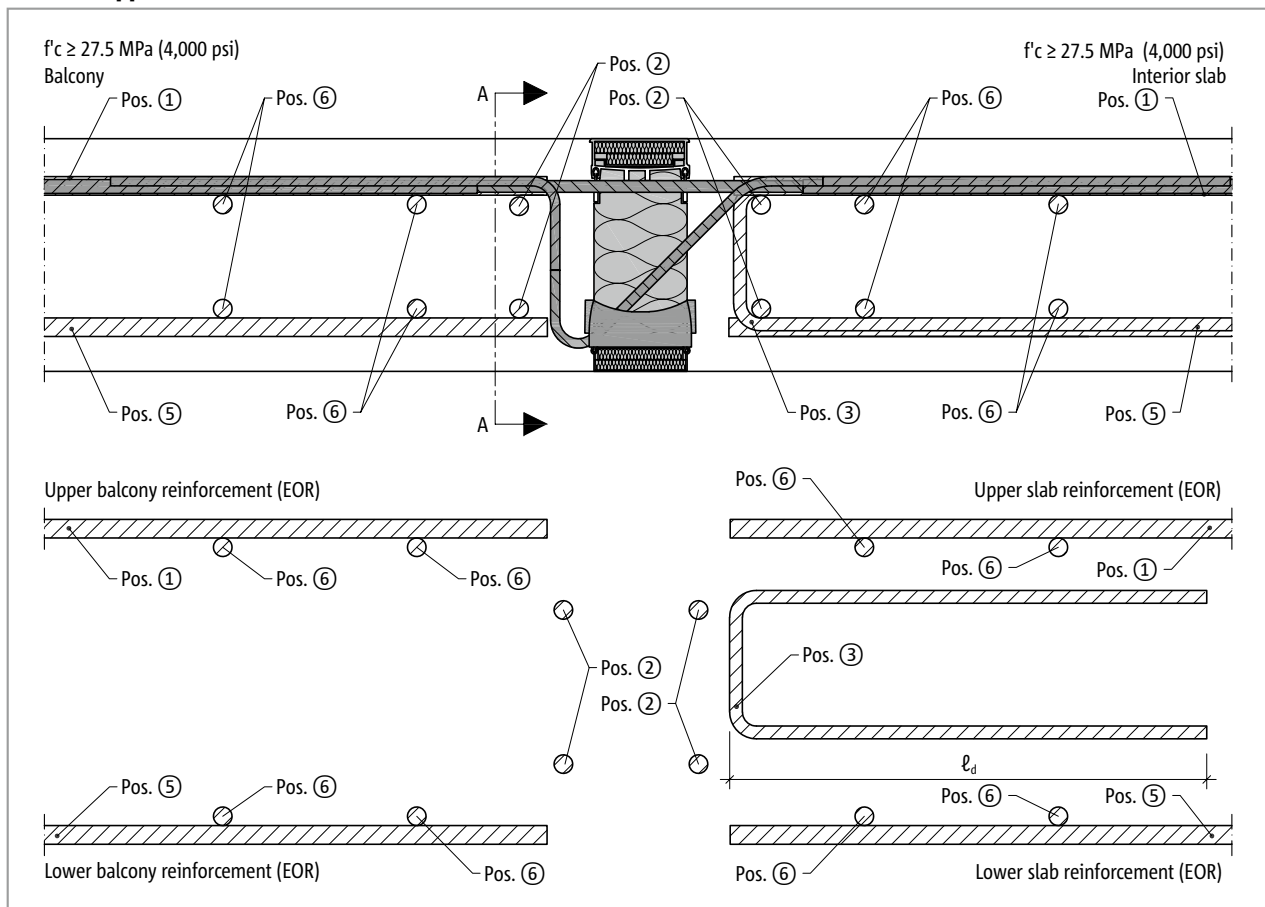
Schöck Isokorb® T Type CK: Cross section of recommended cast-in-place reinforcement (supplied by others) - indirect support
